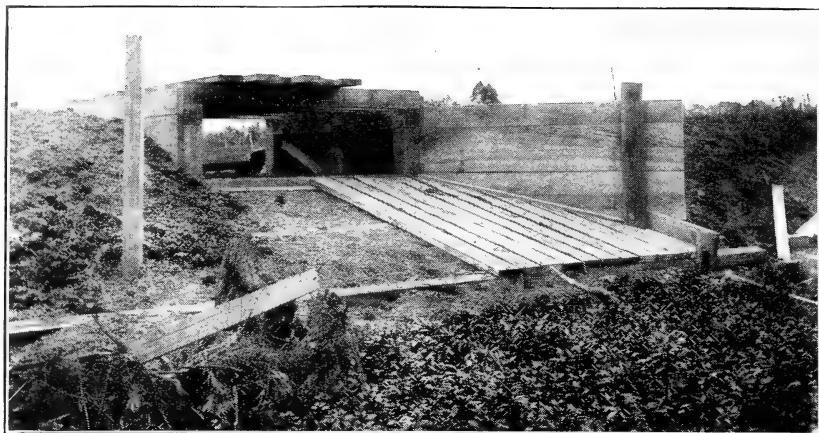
View showing construction of spillway-box and downstream apron in dam.
